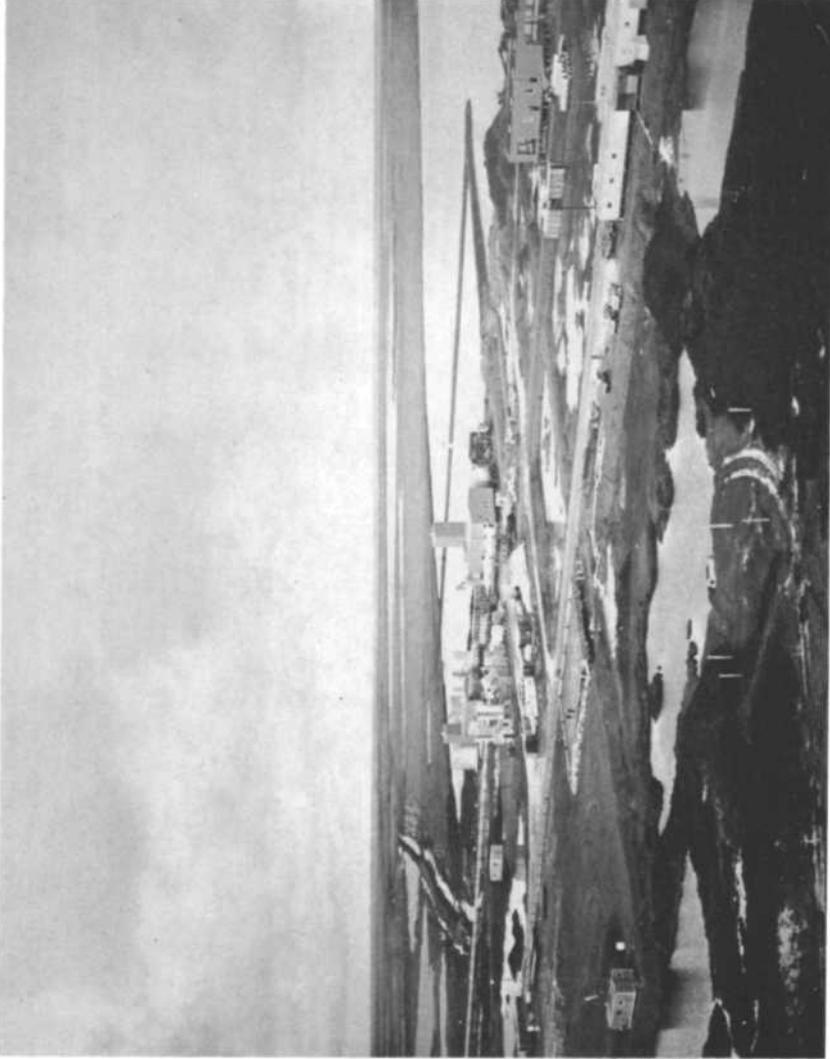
A small topping plant (refinery) for local fuel needs under construction at Prudhoe Bay. Note the improper road construction in the left background; no gravel has been used and the adjacent tundra has been scraped to the center to form a raised road bed. Thawing of the permafrost in the adjacent ditches is occurring and inducing slumping and calving of the adjacent road and tundra.
